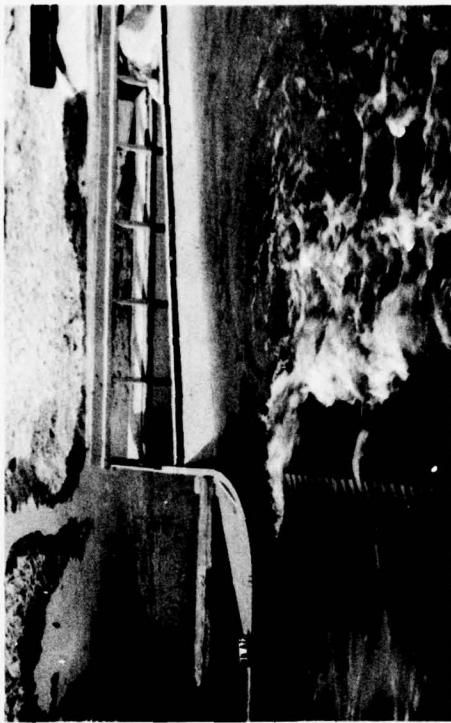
Spillway plan F, rock protection plan 2, scour after 30-min run, discharge 254,000 cfs
